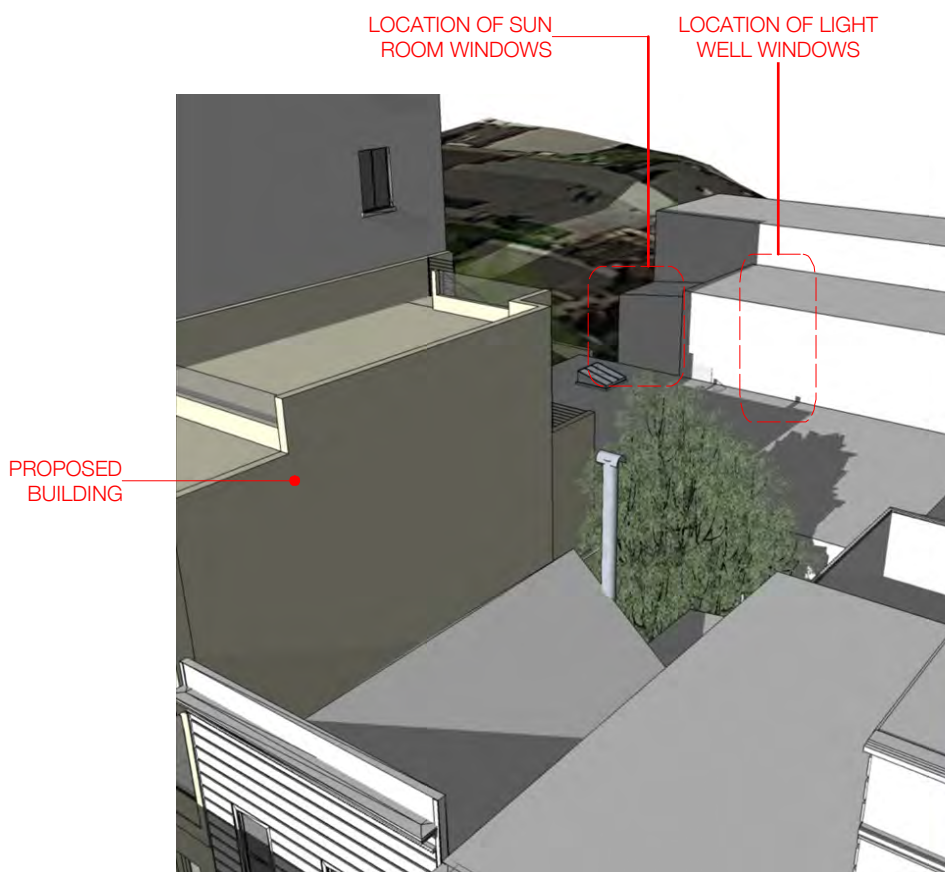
PROPOSED SHADOWS - SEPT 1ST, 4:30PM
